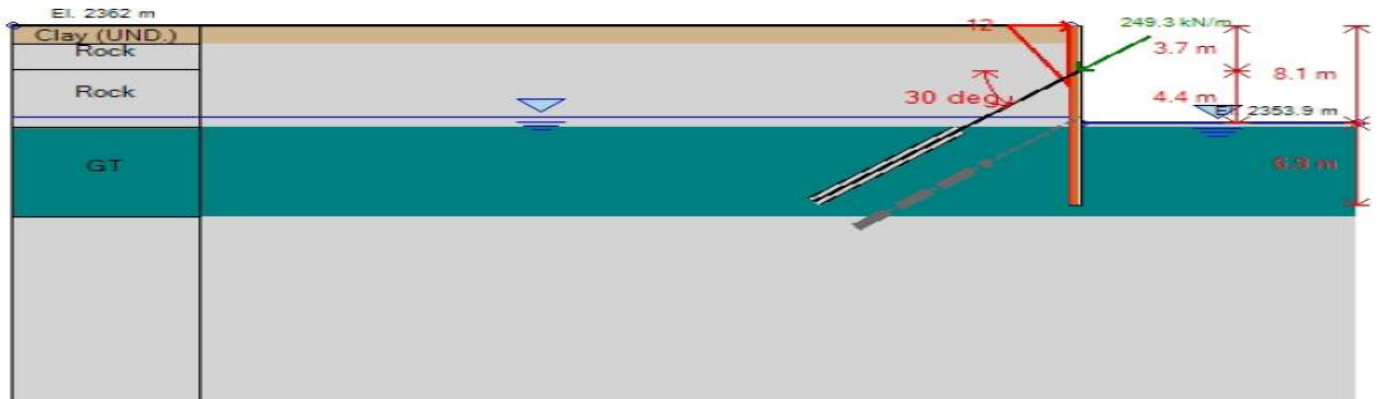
the second stage excavation for 3.7m and 1.5m pile spacing
